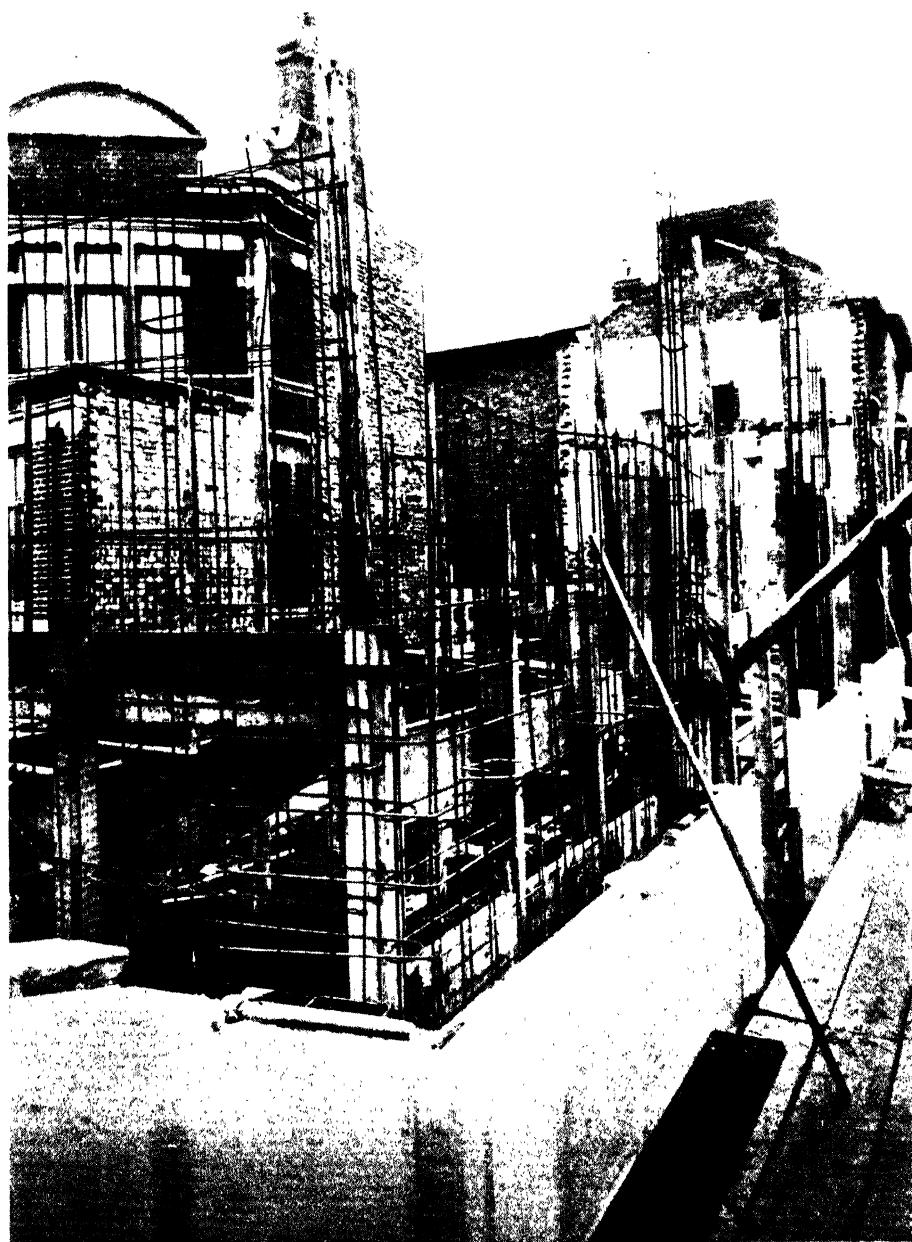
REINFORCEMENT FOR NATIONAL PROVINCIAL BANK BUILDING, EALING
